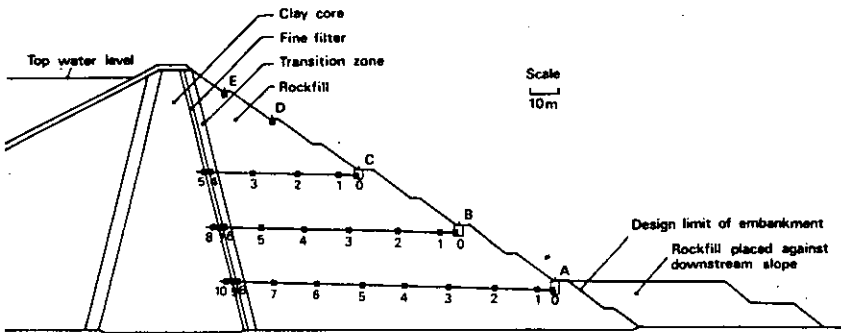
Cross-section of Llyn Brianne dam showing location of BRE instrumentation.
